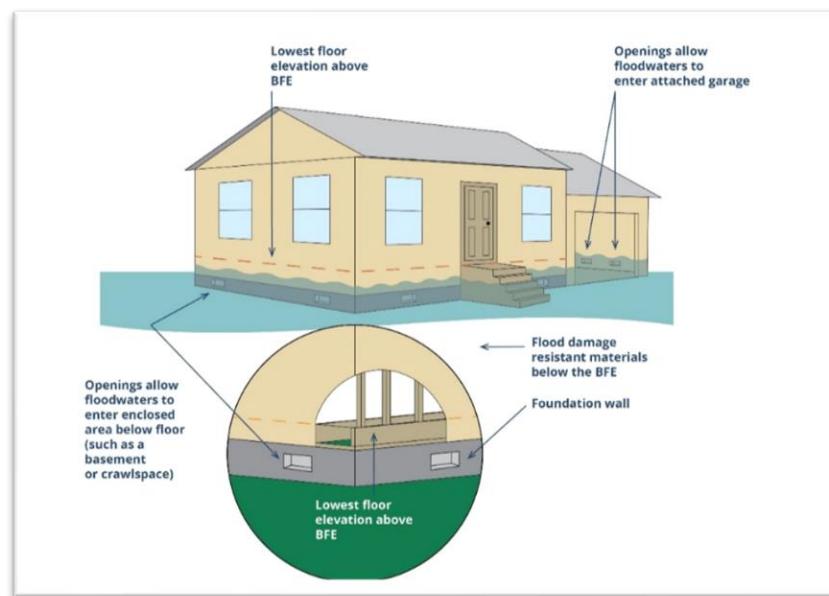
Example lowest floor of a structure within or adjacent to the SFHA
